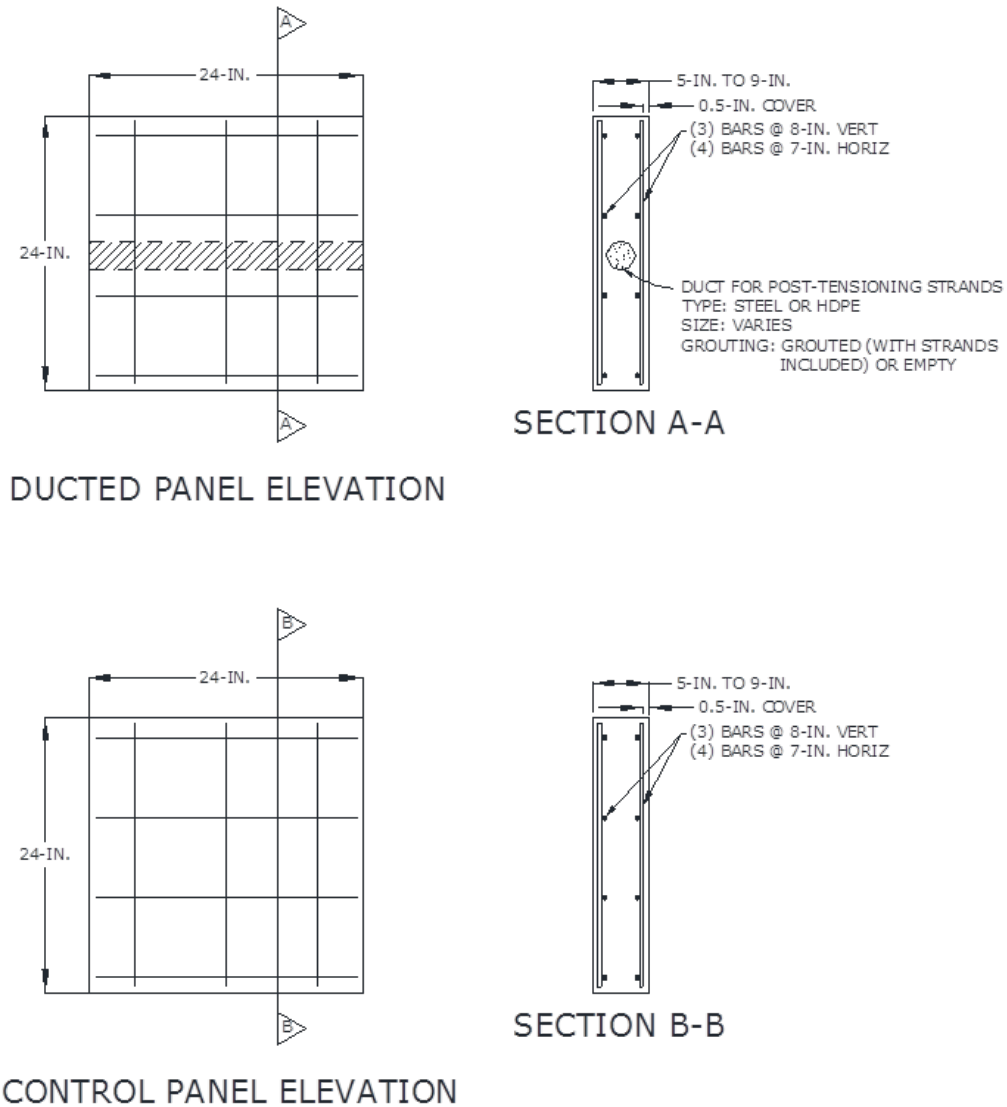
Basic Panel Reinforcement and Duct Layouts
